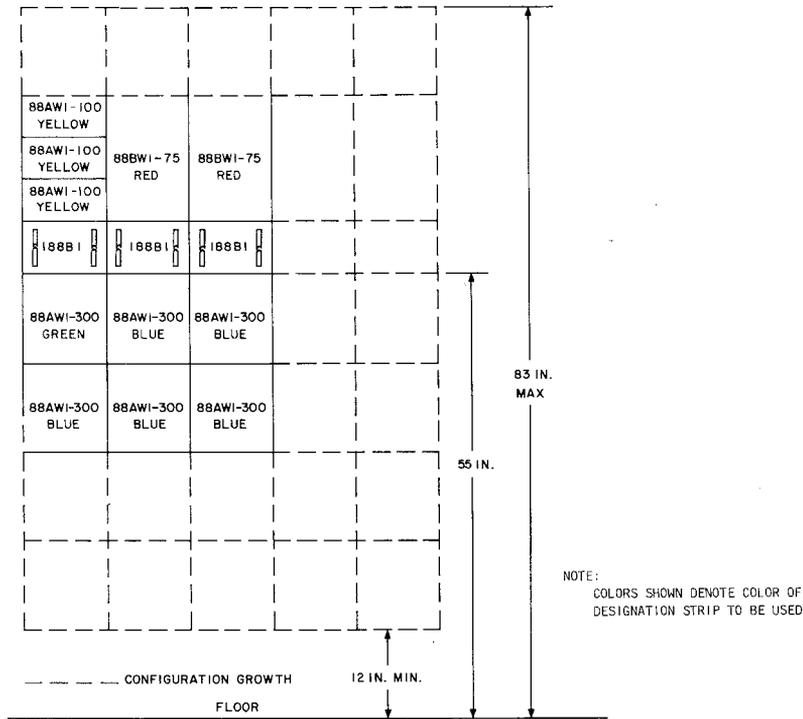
Basic Layout of Wiring Blocks in Riser Terminal
